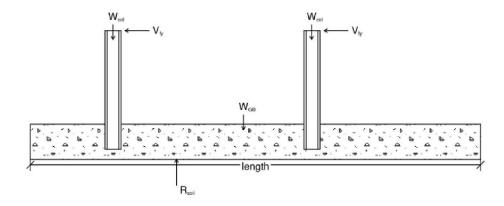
Cantilever column pair with grade beam and soil reaction resultant.
